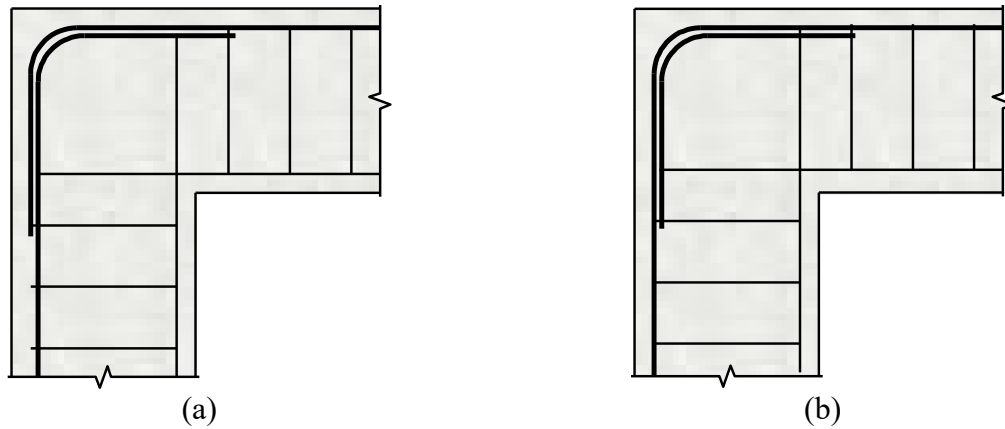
Additional splice details (adapted from Yuan et al.⁶)
